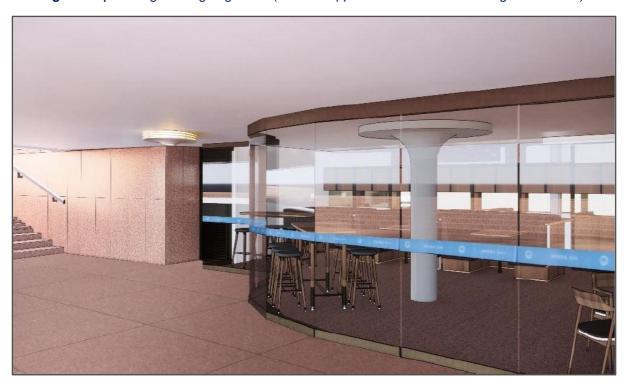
| Proposed Glazing Re-alignment (Source: Applicant's Architectural Design Statement)
